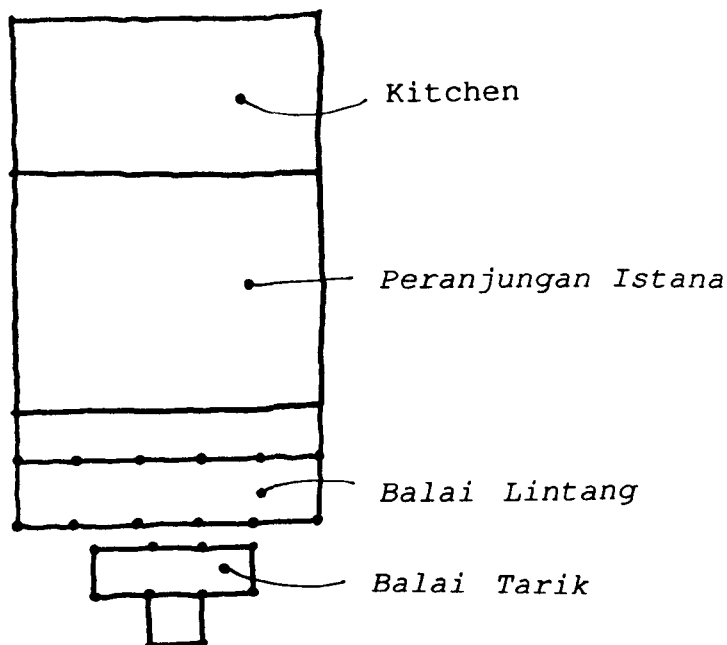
The original floor plan of Istana Jahar, Kota Bharu, Kelantan (1885).*⁵⁵
